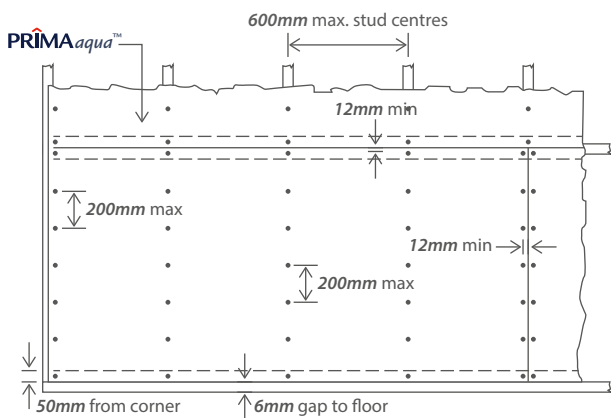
Horizontal Sheet Fixing (Untiled Wall)
